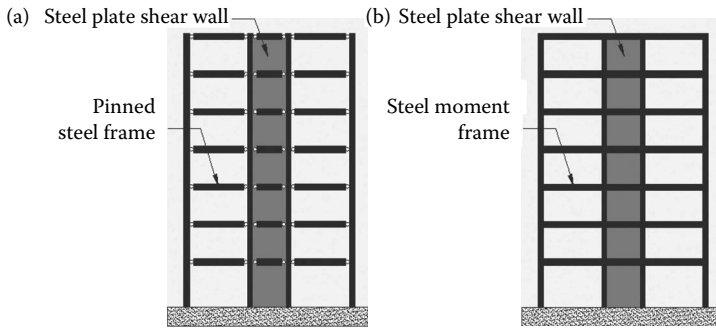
Typical steel structural systems with shear walls: (a) standard structural system (SSS); (b) dual structural system (DSS).
